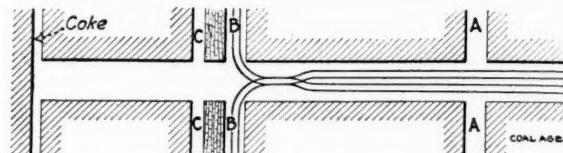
PLAN OF SLOPE BOTTOM, SHOWING ARRANGEMENT OF TRACKS
